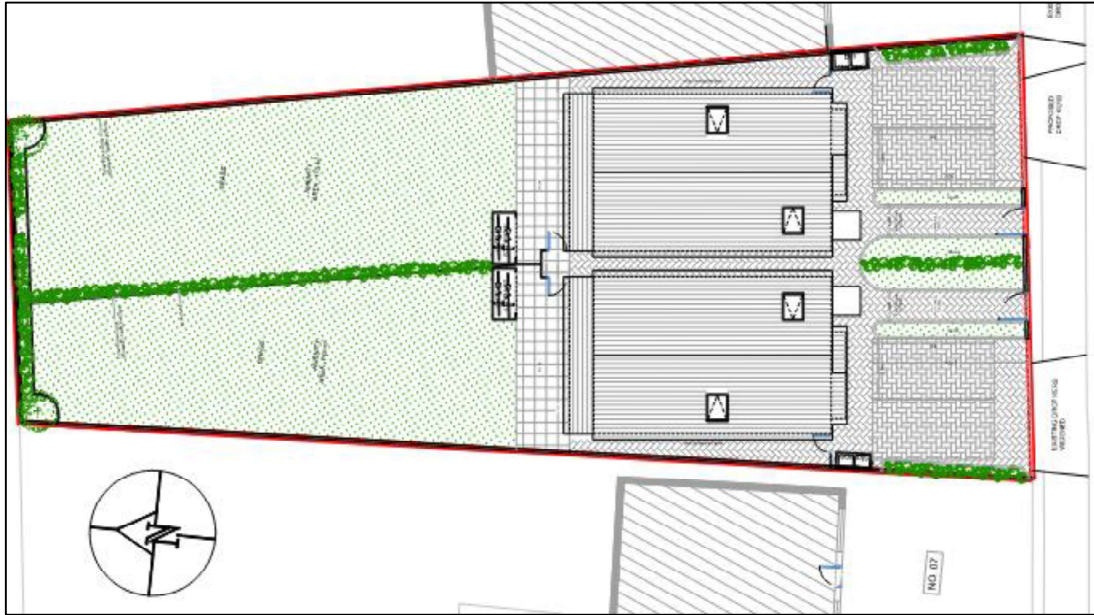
Proposed Plan – DE Architectural Consult Ltd
